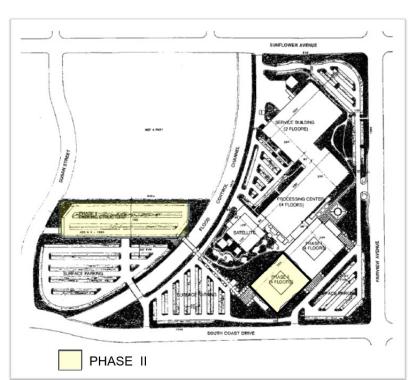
DA-94-01 Approved AAA Site Plan
